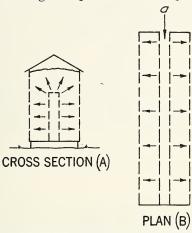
Frame crib with ventilator, showing cross section (A) and plan (B). End walls in plan (B) should be covered for artificial drying but left uncovered for natural ventilation. Air blown into ventilator at a escapes through corn as shown by arrows.
